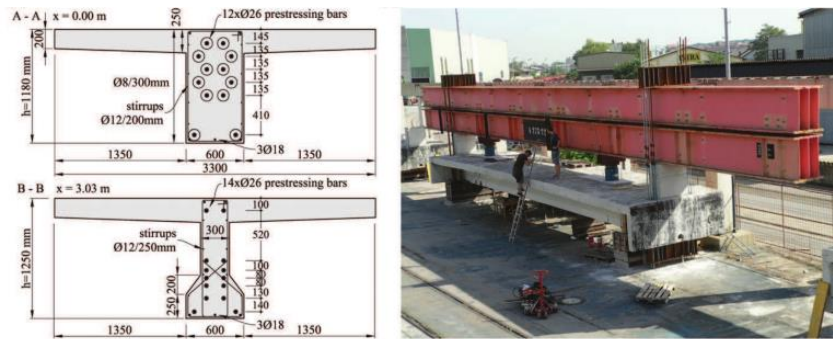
Cross section of girders (left) and open-air test set-up (right) [1]
